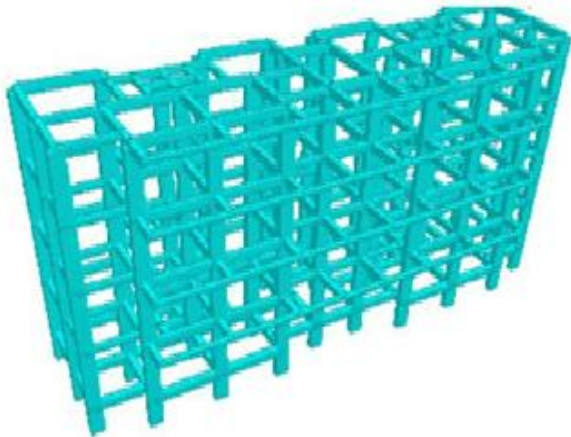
3D View of G+3 Conventional Building in Staad Pro
